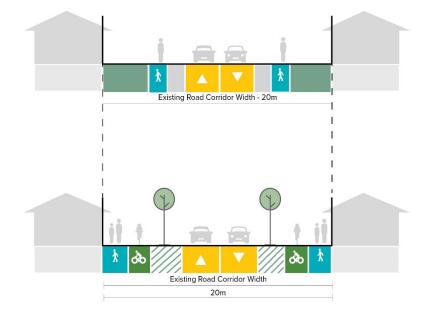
Öpāheke Road (Urban) corridor typical cross section
